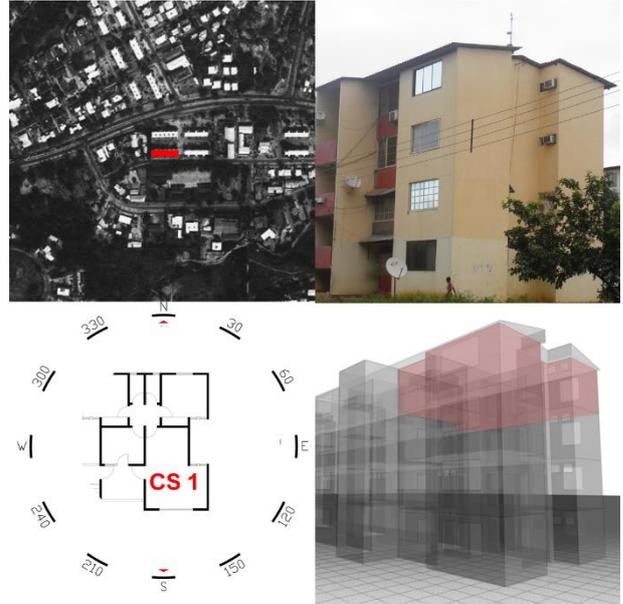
Location, photograph, plan of Cases study building 1 and the selected room (CS 1).
